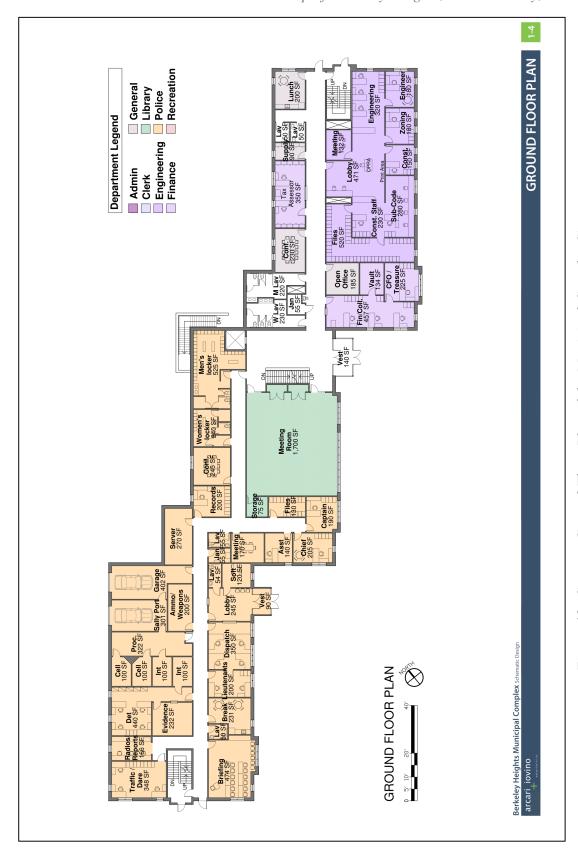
Concept Ground Floor Plan of the Municipal Complex Site
